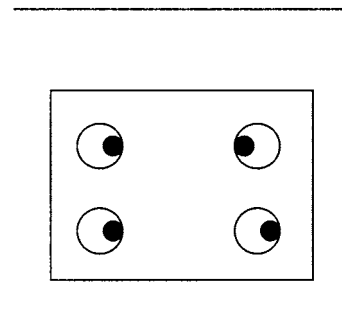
a. Plan view of a baseplate close to concrete foundation edges and possible arrangement of anchor rods.
